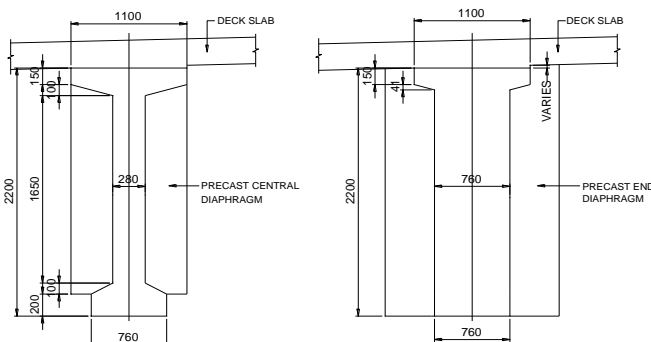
Cross sectional details of I girder for Four Girder Arrangement
